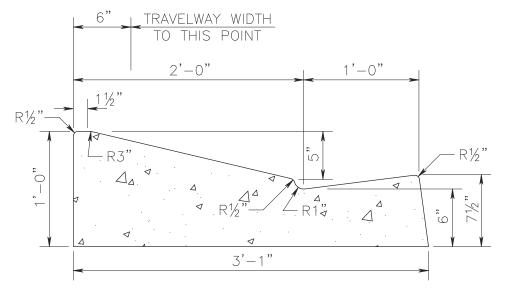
A - Street Details: Curb and Ramp Detail
